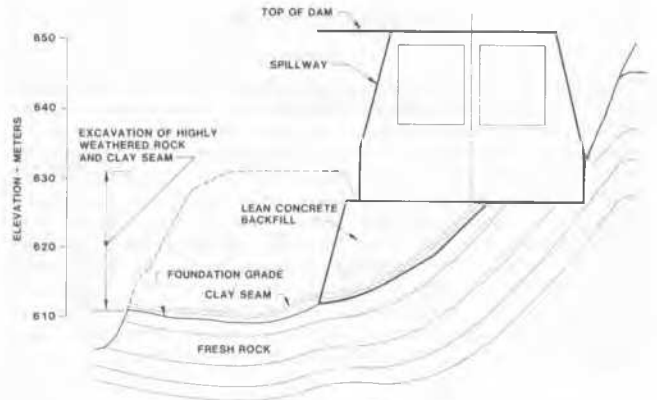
LOWER DAM SPILLWAY FOUNDATION OVEREXCAVATION
